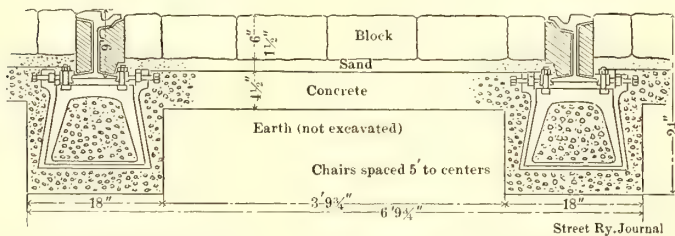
CROSS SECTION OF CONCRETE TRACK CONSTRUCTION
